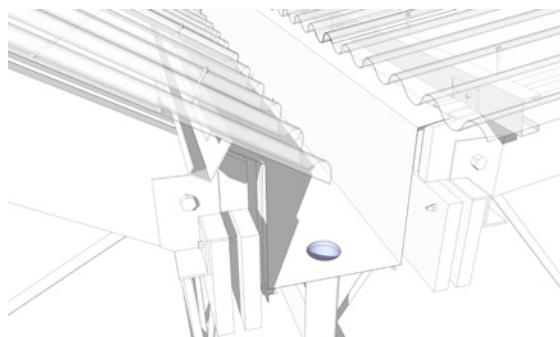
Custom-made steel gutter and uPVC downpipe
